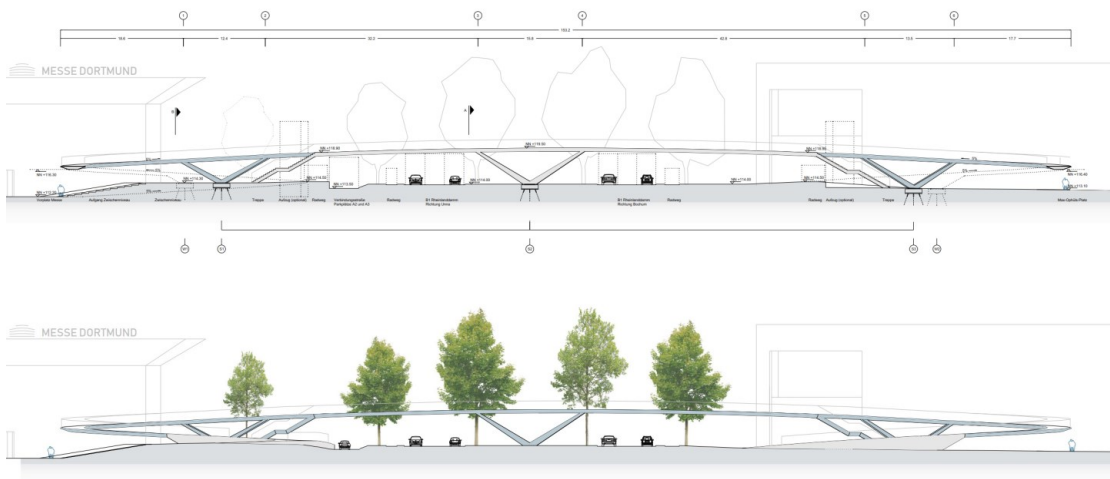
Footbridge over the Rheinlanddamm in Dortmund - Elevation view
